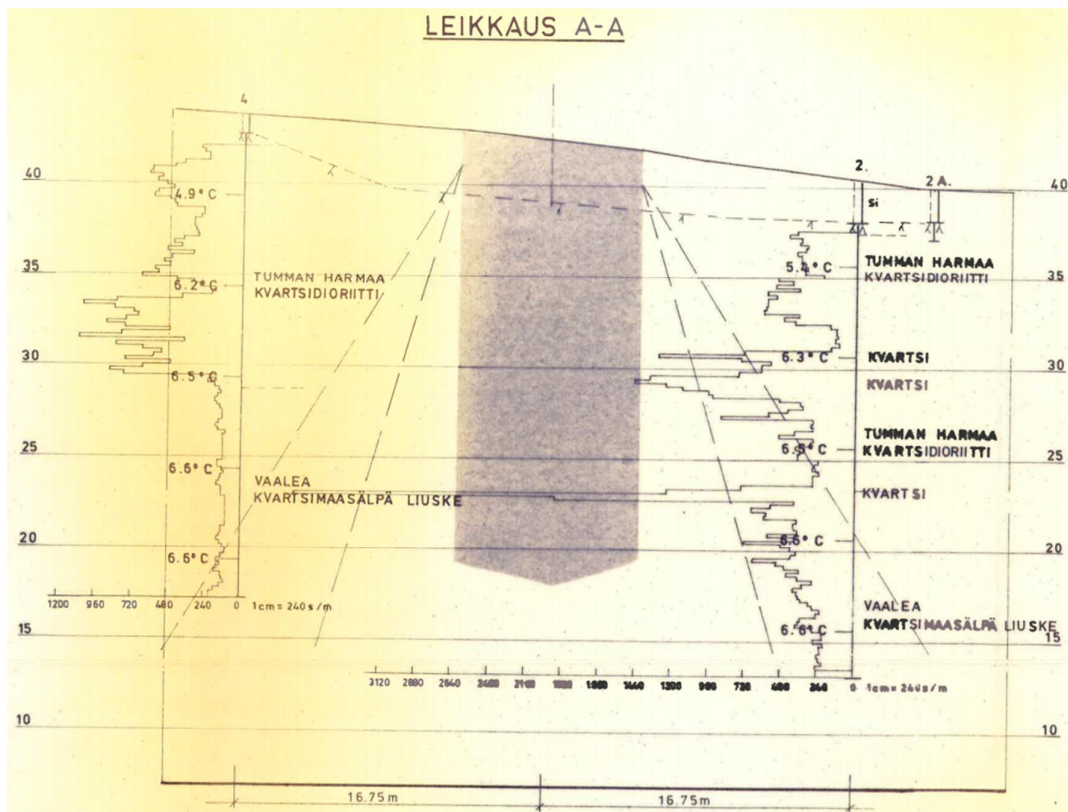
Cross-section A-A including data on the soil and rock types plus elevations
